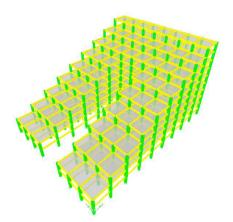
A 3-D View of 9<sup>th</sup> storeys U- shaped setback building.
